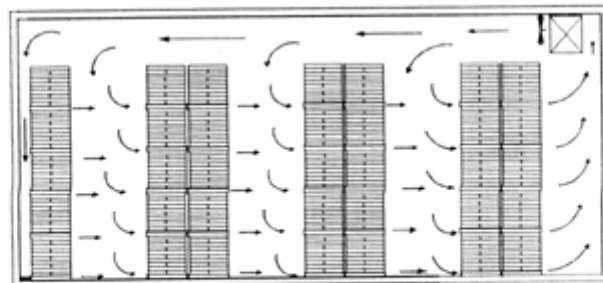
Cold store with suspended unit cooler and head space above pallet stacks
